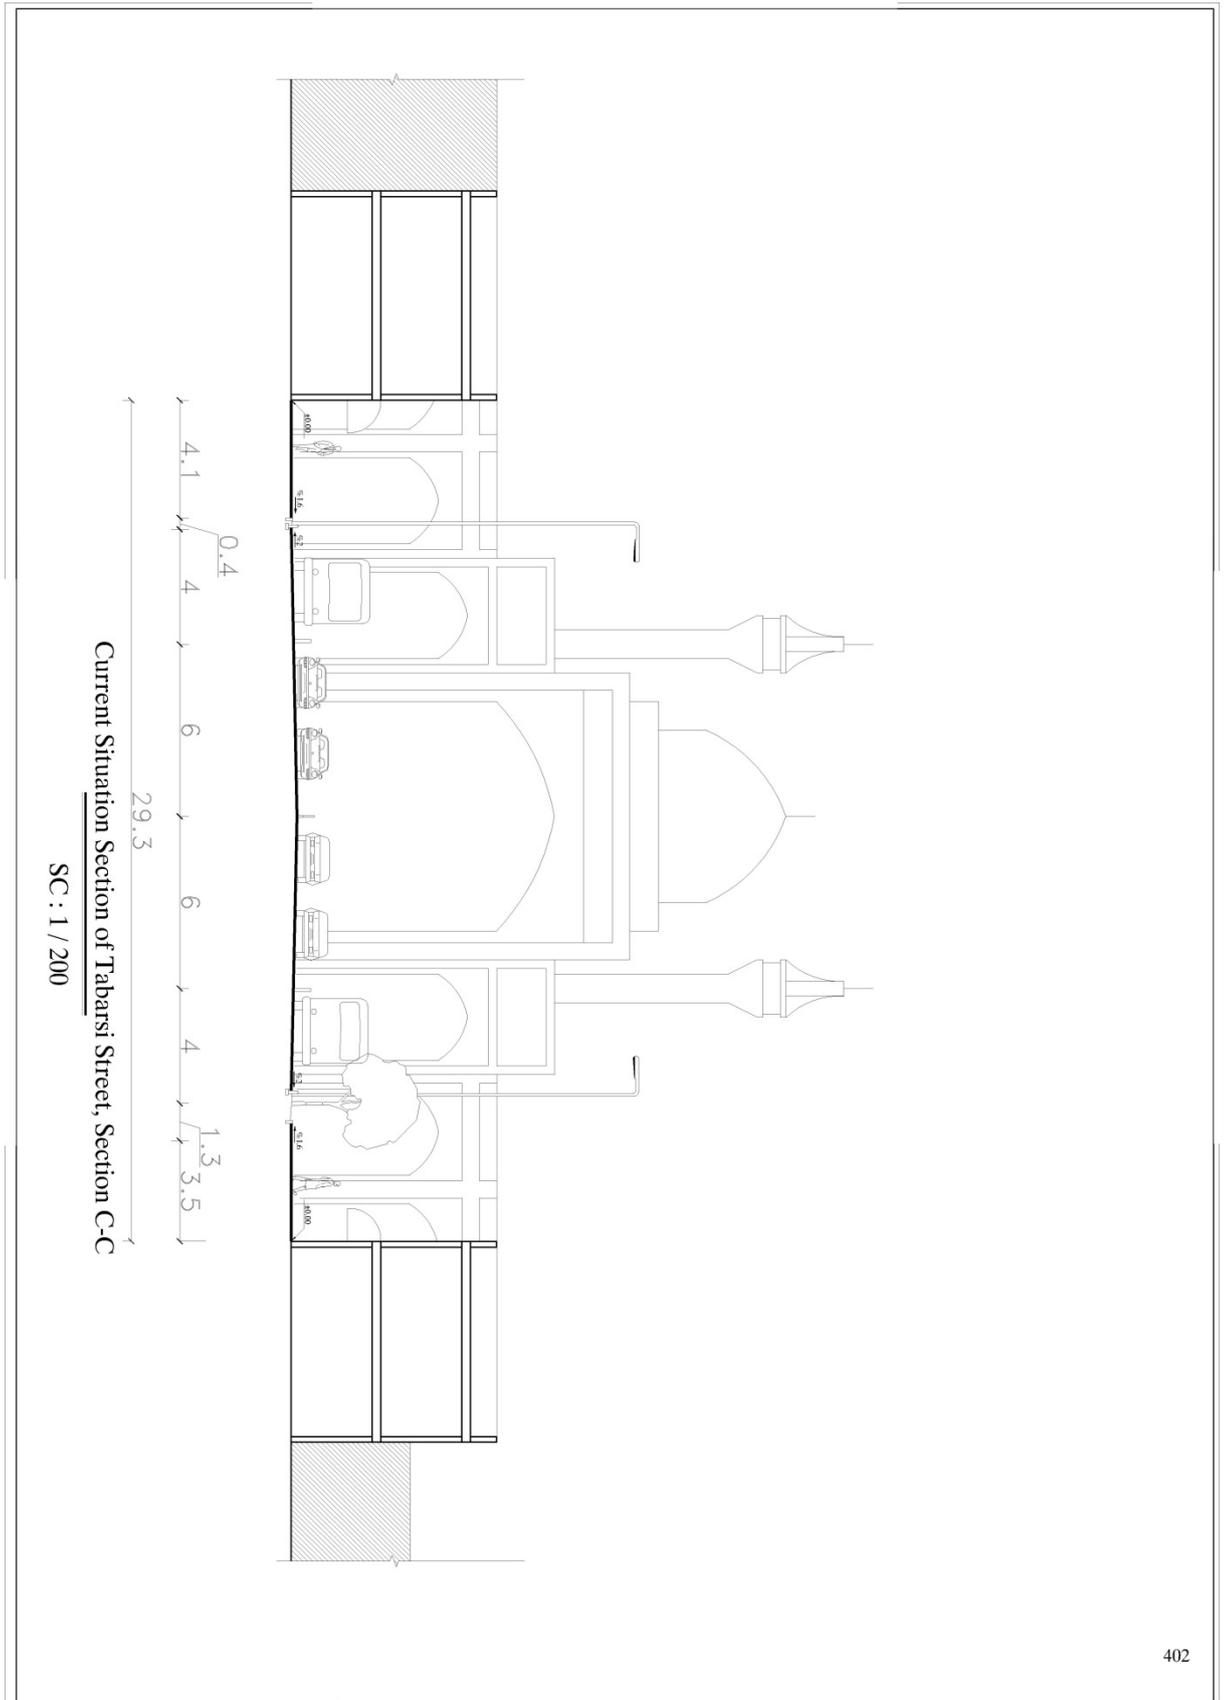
Section of Tabarsi Street, Section C-C. (Author)
